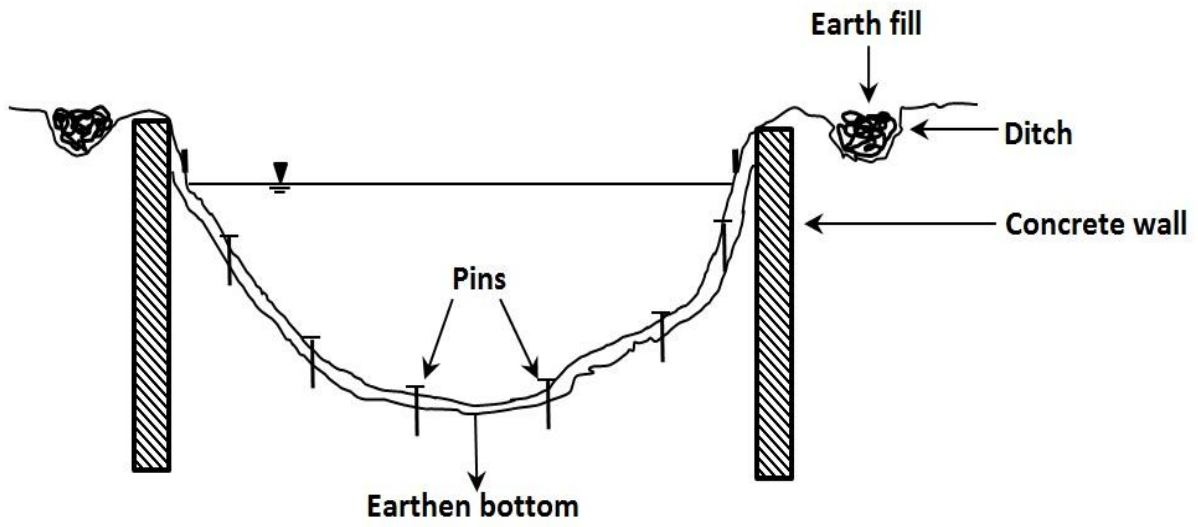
Sketch (not to scale) of attachment of geotextile liners to bottoms of earthen ponds.
